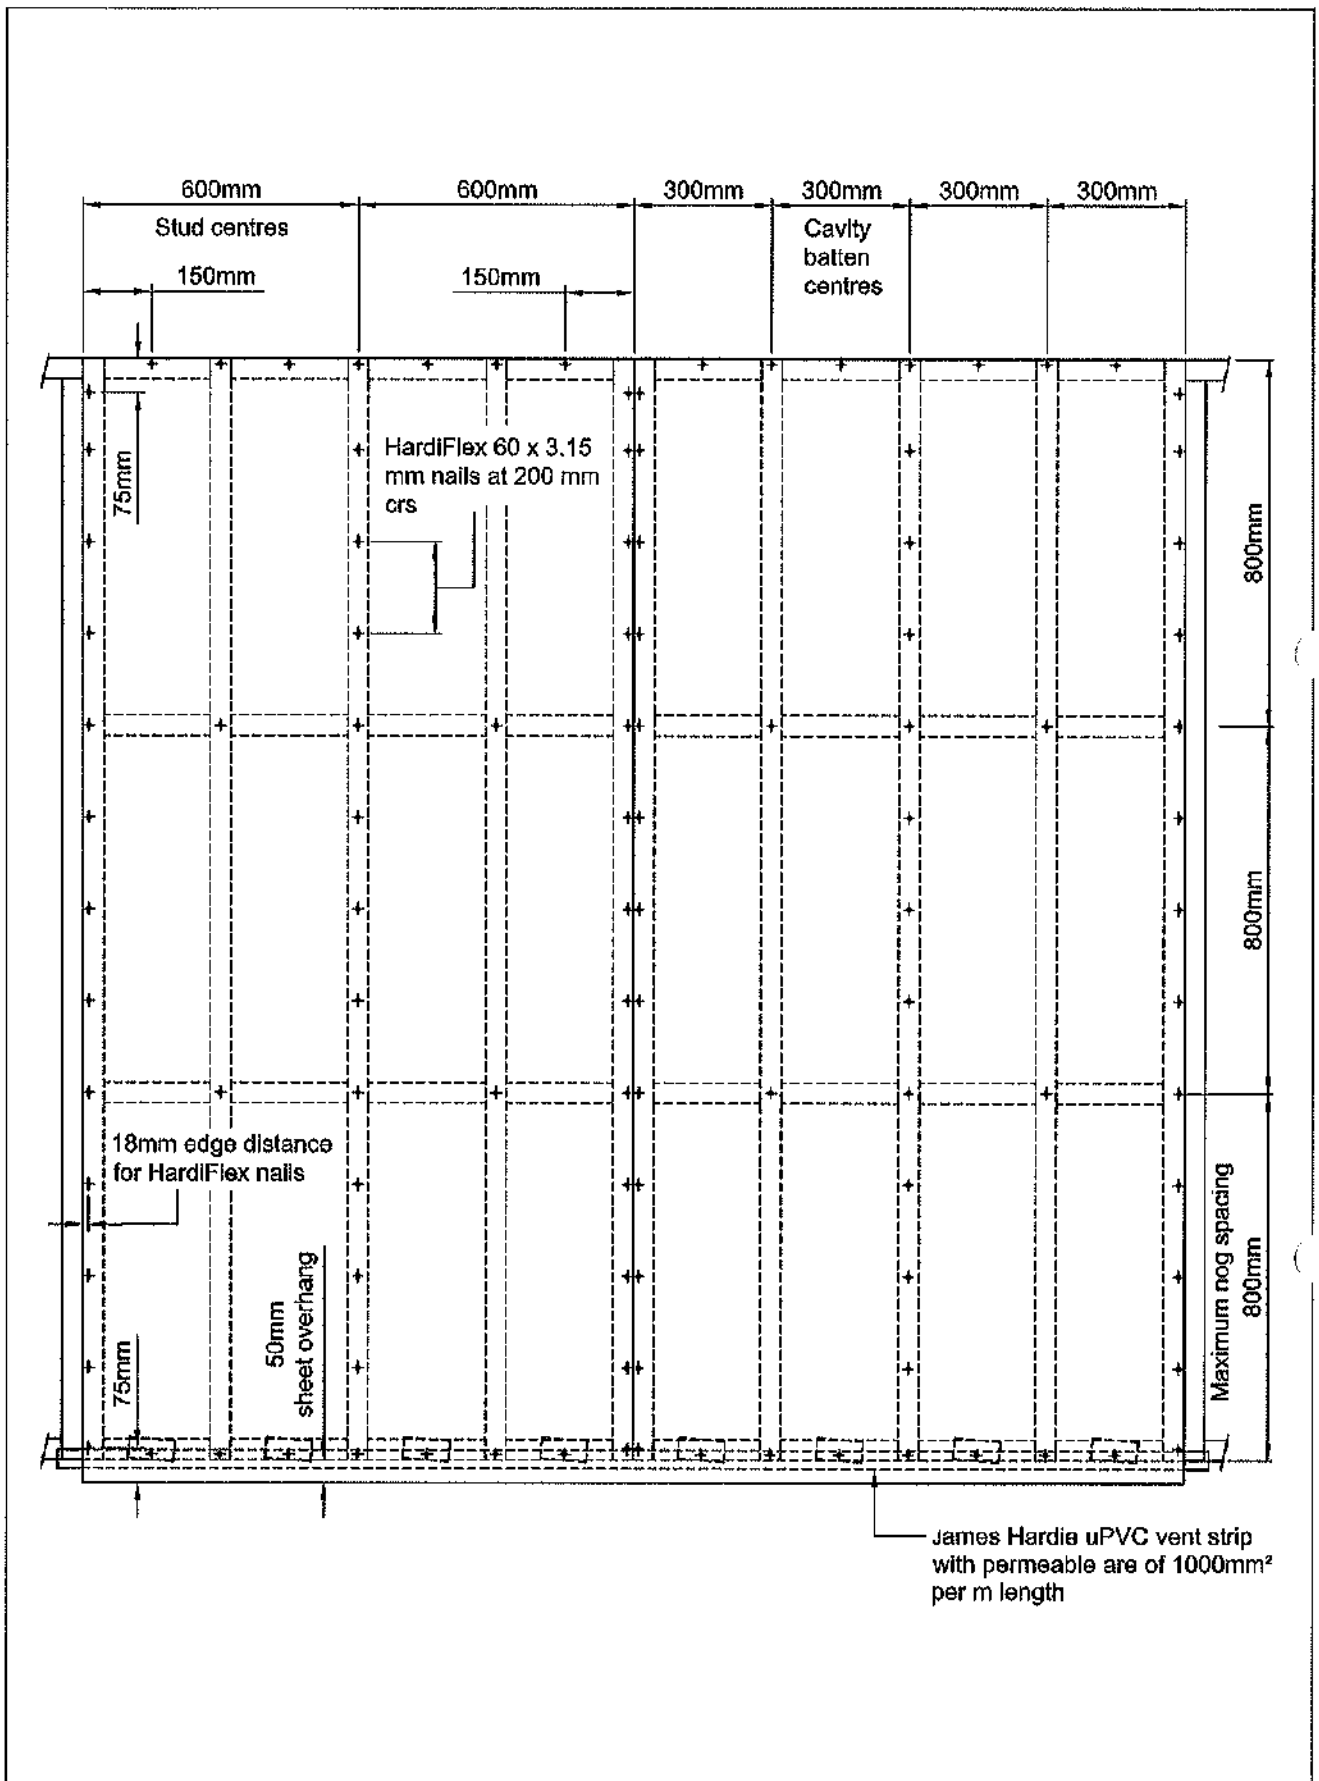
CAVITY FIXED TYPICAL PANEL FIXING SETOUT
